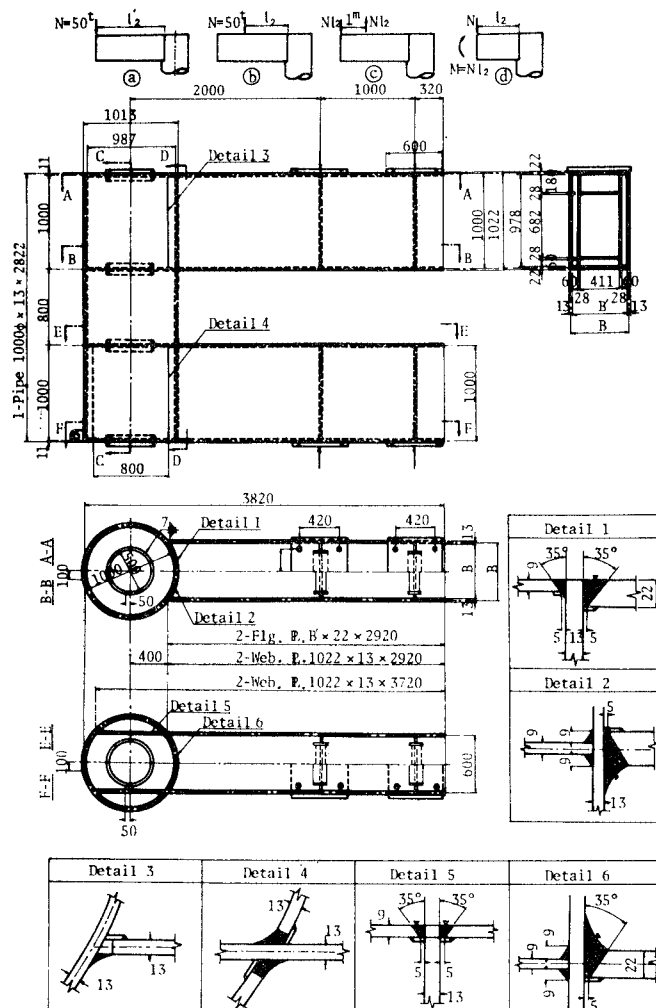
Test Pieces of Rigid Frame Corner (in mm)
